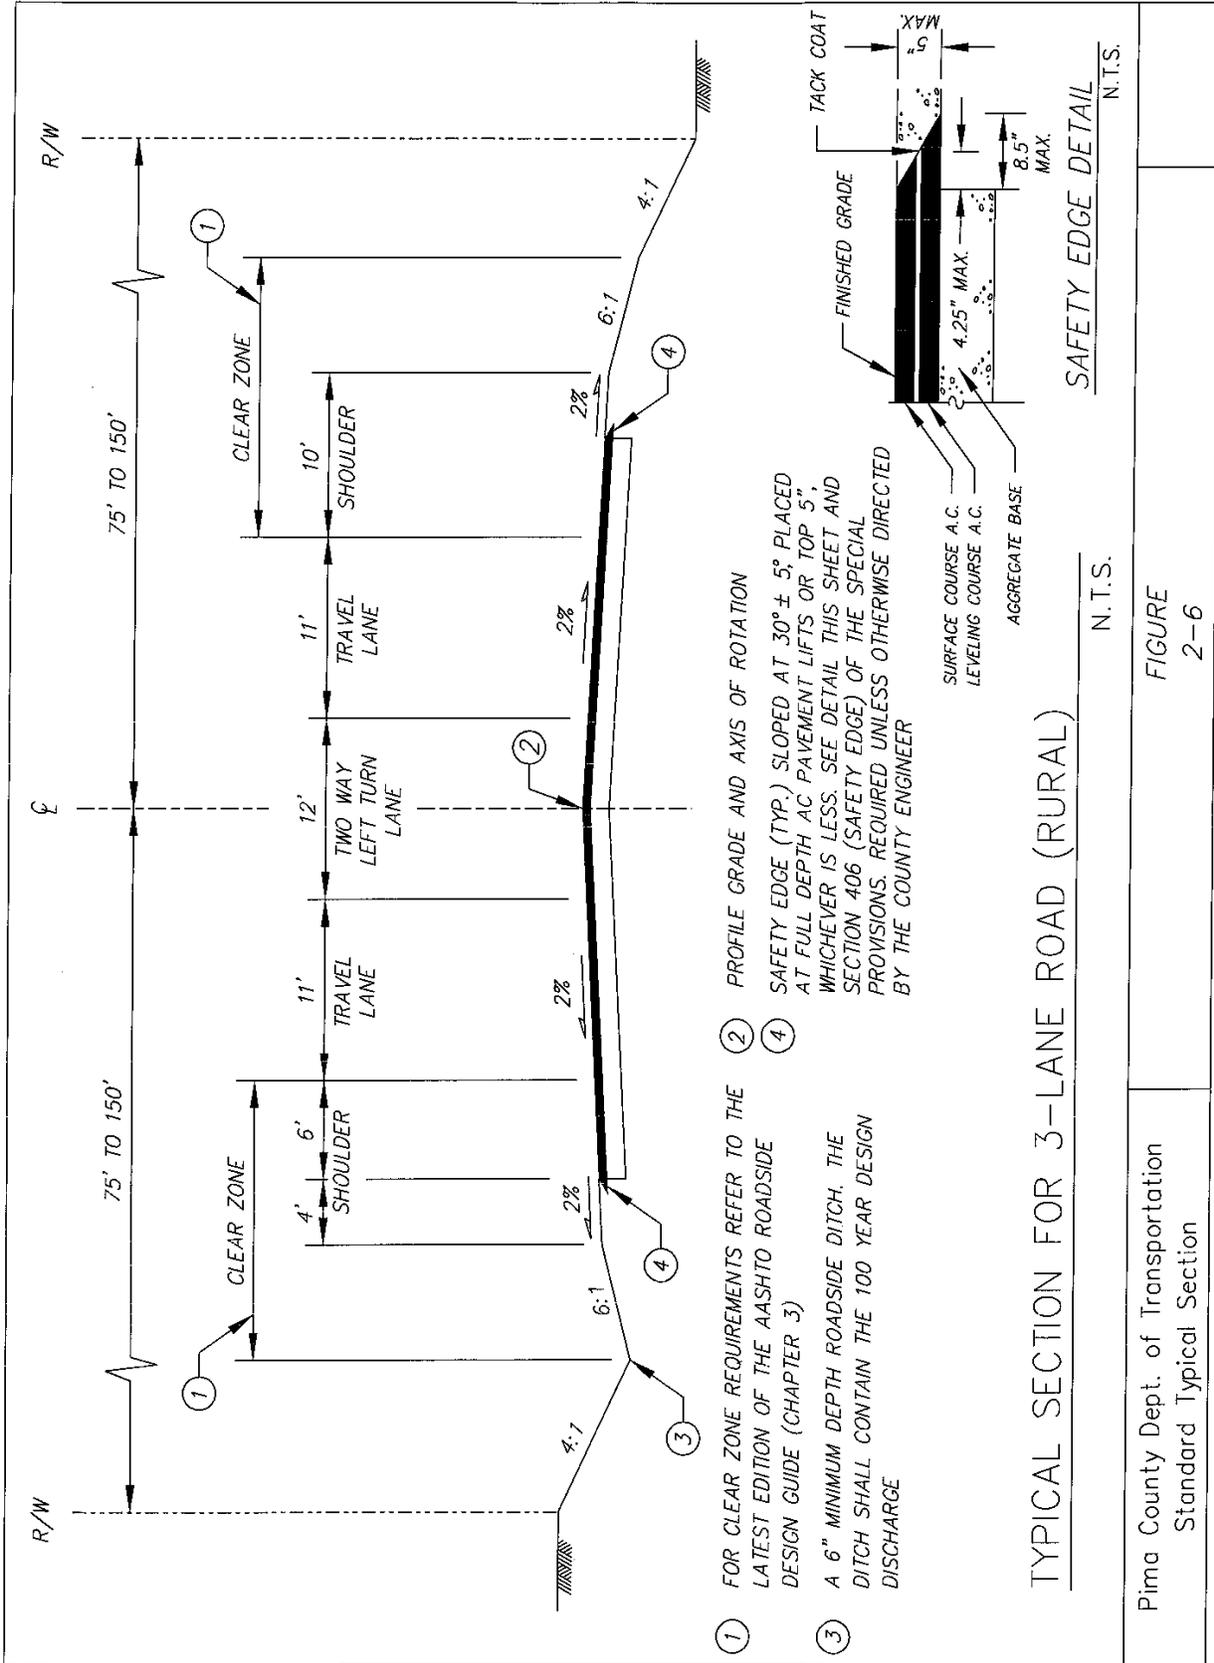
Typical Section for 3 Lane Road (Rural)
